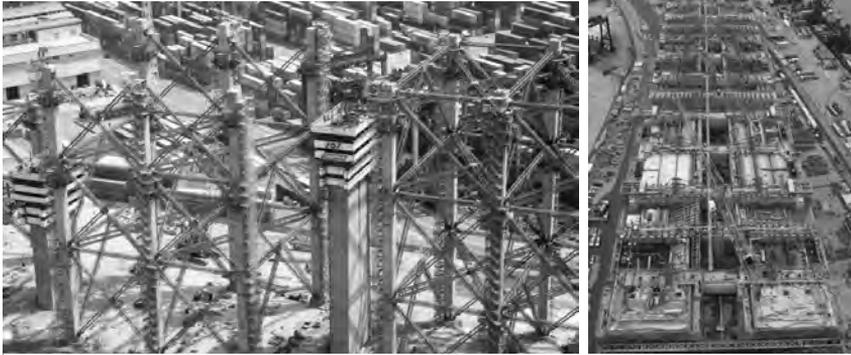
Falsework erection (left), staged casting of longitudinal girders (right)
